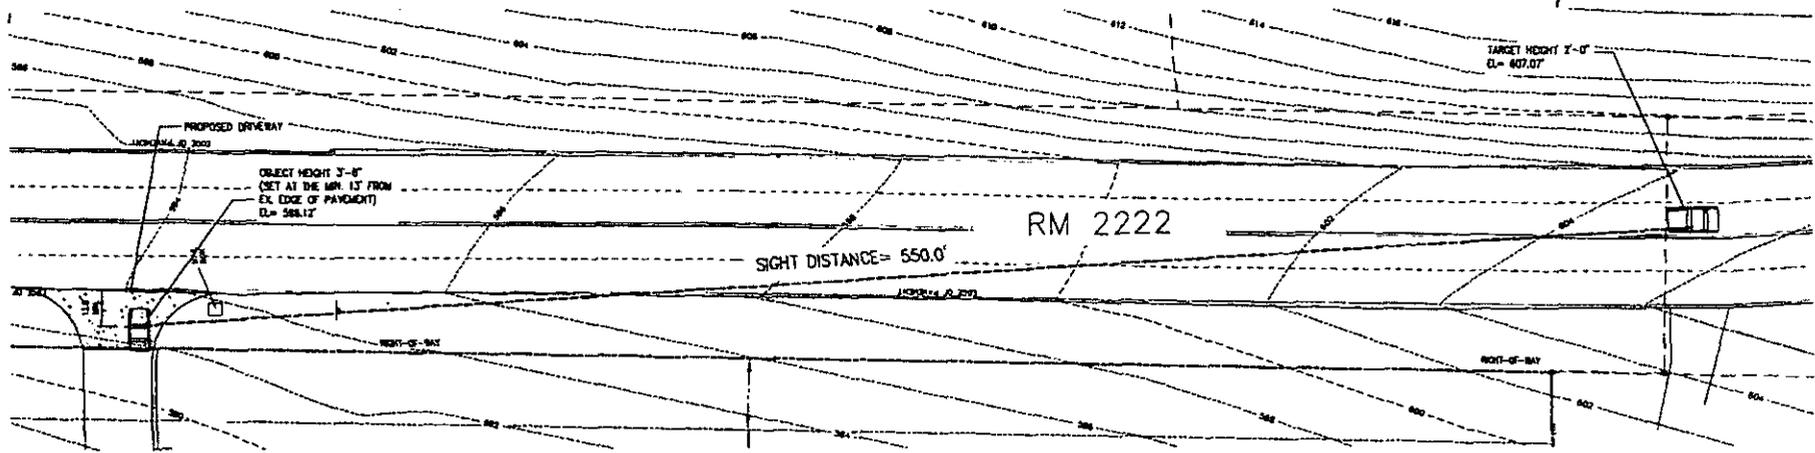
## EXHIBIT M - DRIVEWAY DETAILS - (2 of 5)
